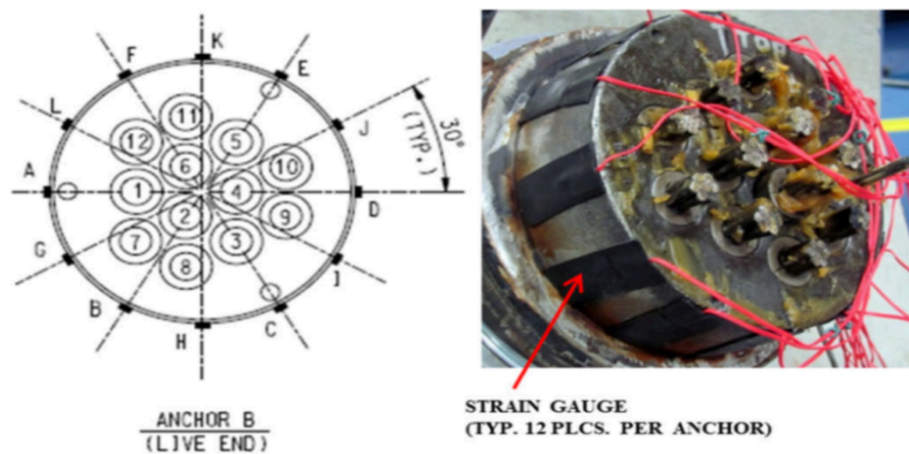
Anchor instrumentation (Abdullah et al., 2016)
